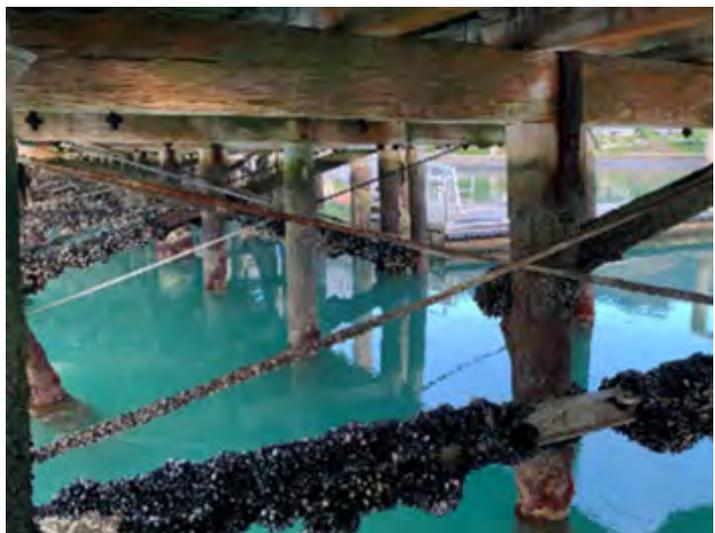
Steel tension bracing replacing missing hardwood timber bracing.
